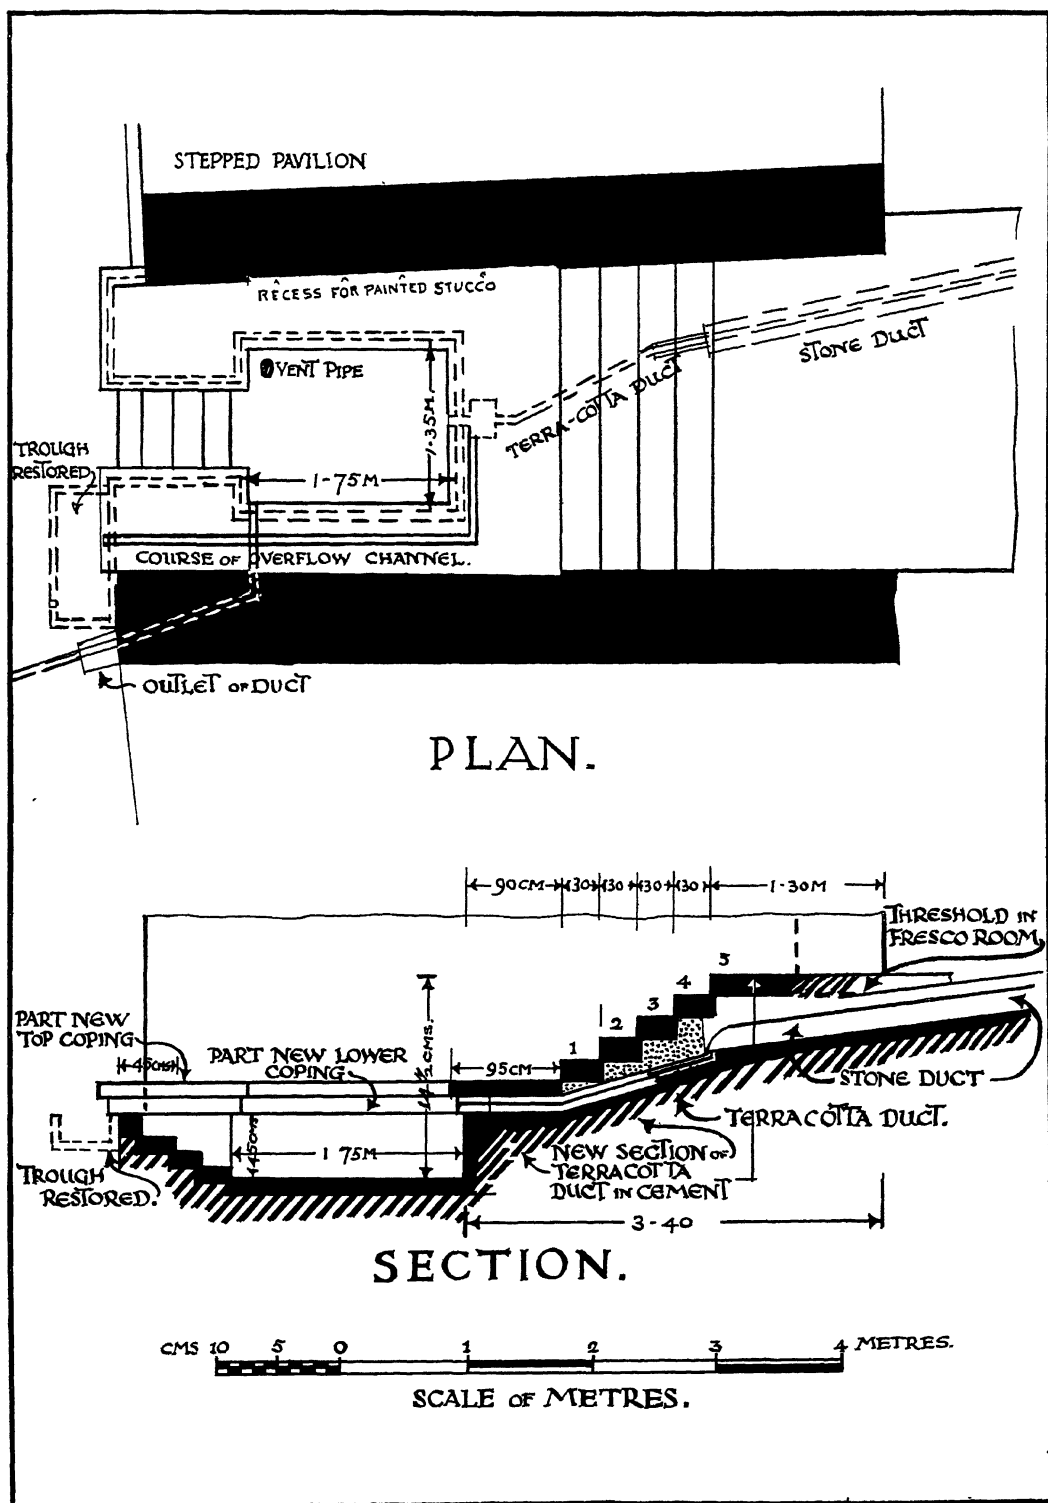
PLAN AND SECTION OF BATH FOR WASHING FEET.
